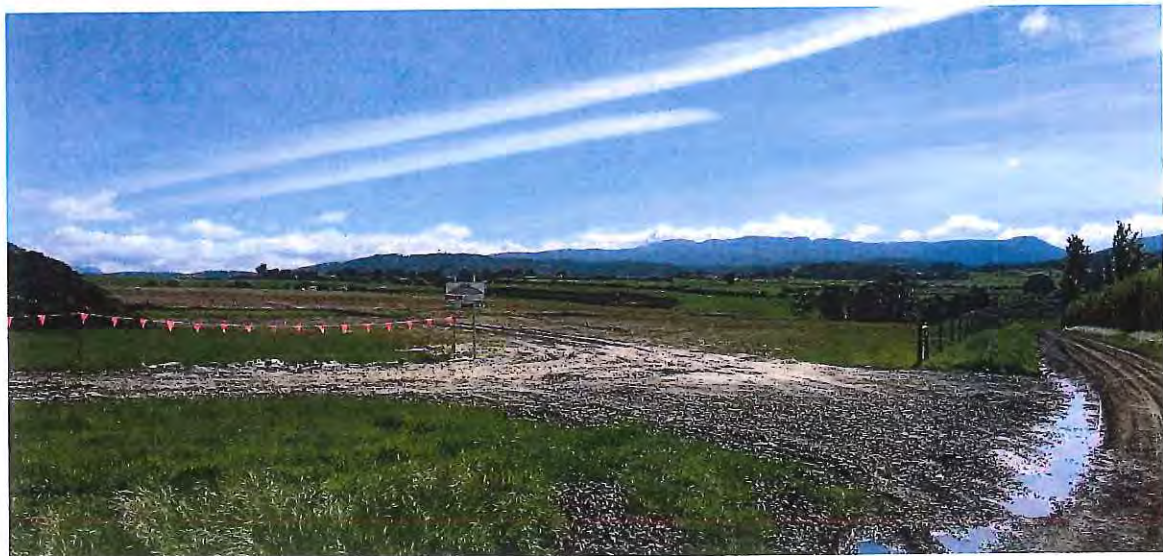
vacant land to the east of Egerton Road that will contain the building area (foreground) and vines (background).
